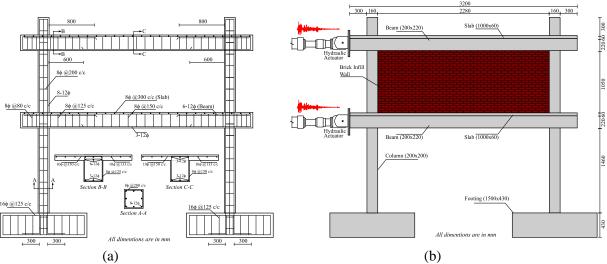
(a) Detailing of test frame, (b) elevation of test frame
